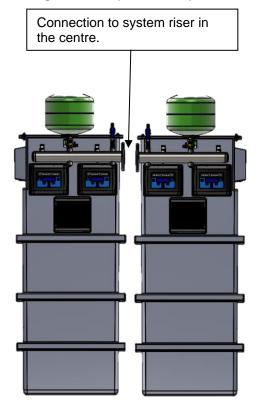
Typical twin breaktank, 4 pump module arrangement.
